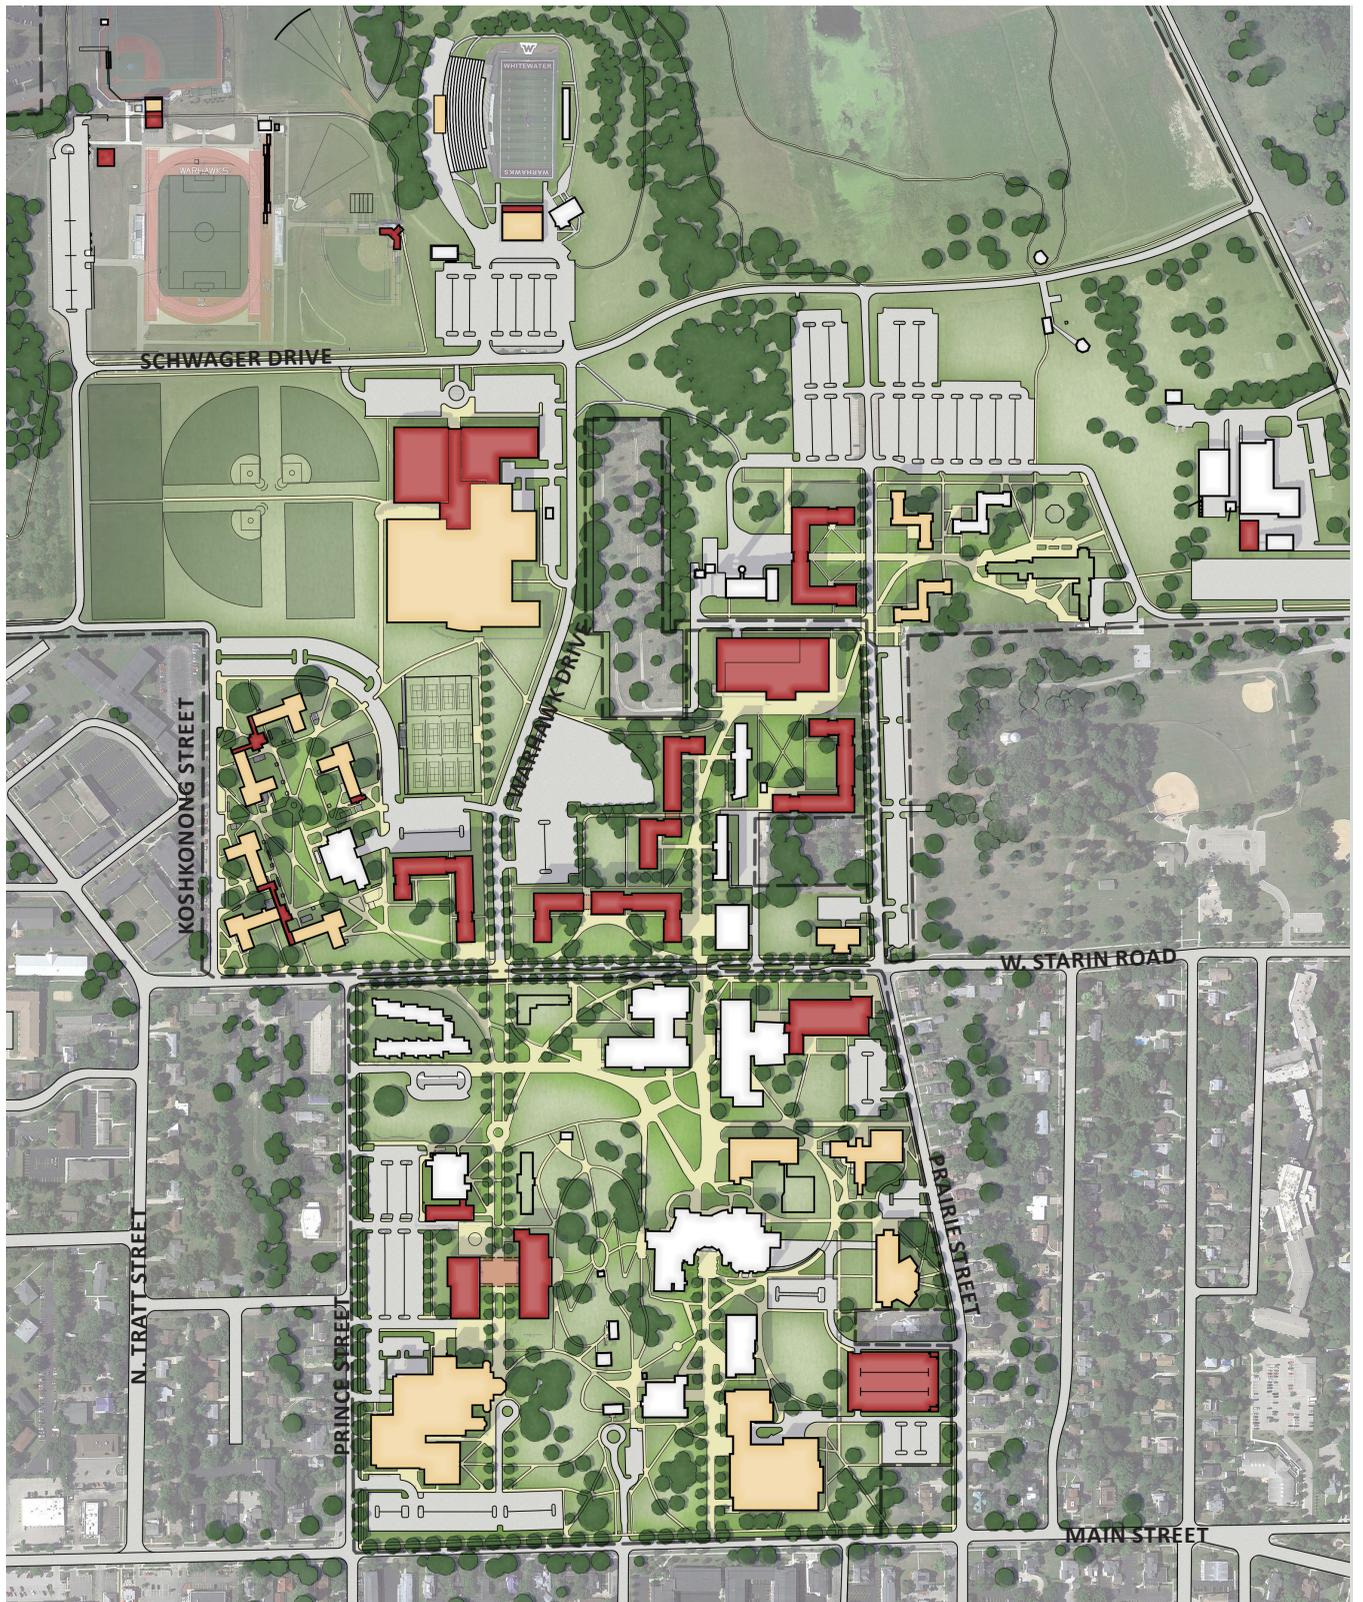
COMPREHENSIVE CAMPUS MASTER PLAN DETAIL
